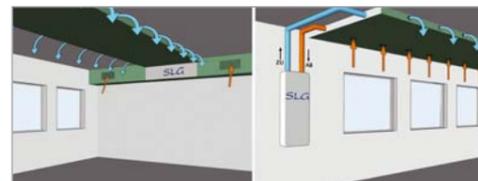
The compact central units can be installed almost anywhere in a space-saving manner, e.g. as ceiling or wall units. The air intake and exhaust ducts become a design element. Acoustical and lighting components can be integrated (Photo: GLT).
